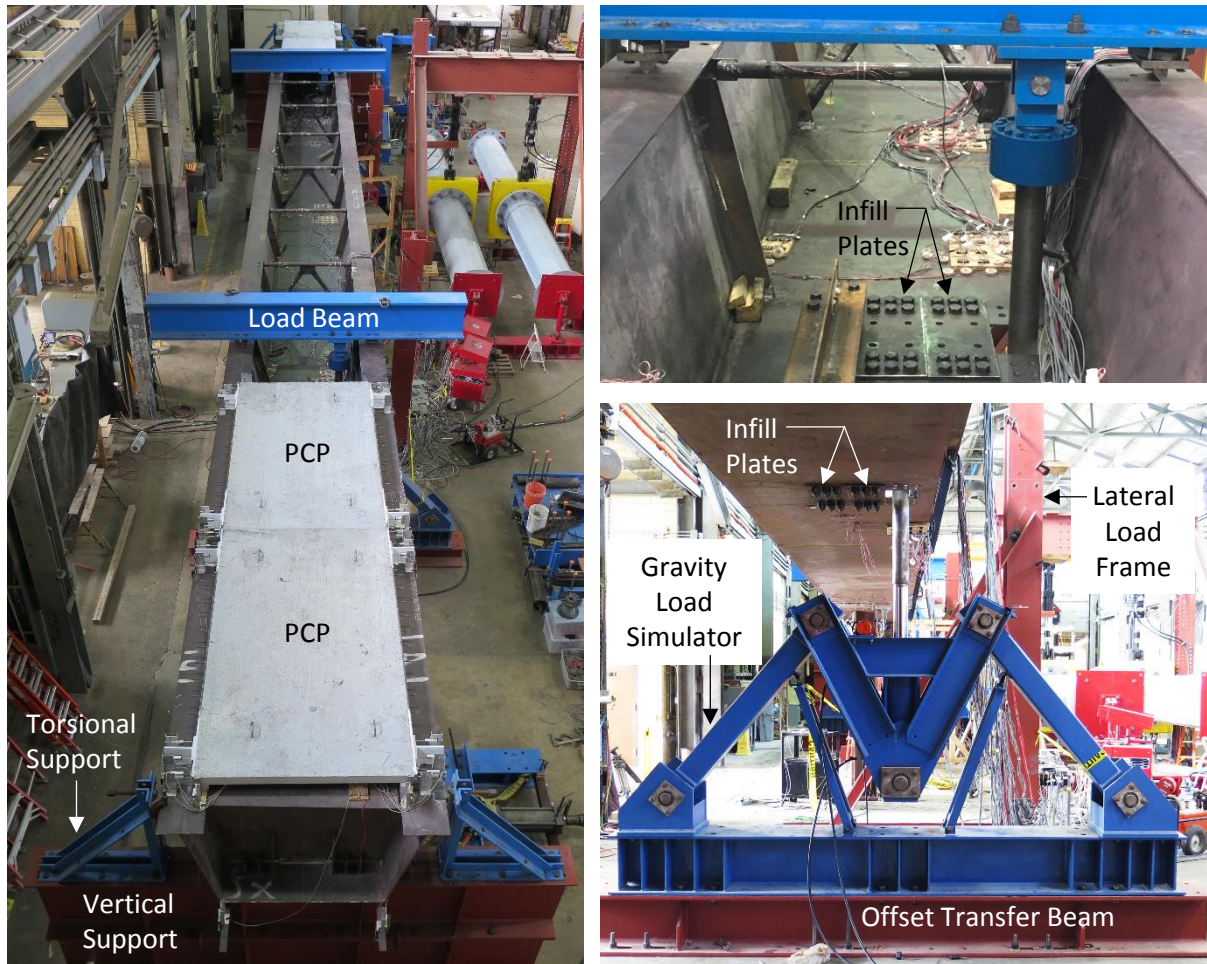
Tub Girder Experimental Test Setup - Simply Supported
